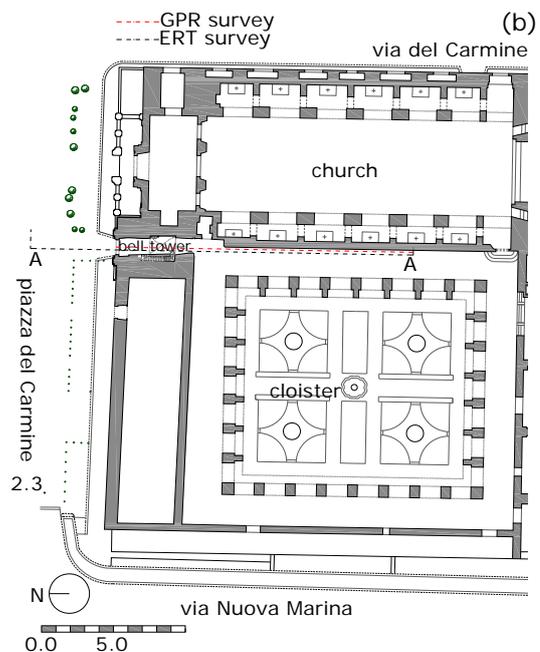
Plan view of the Carmine bell tower and location ERT and GPR surveys.
